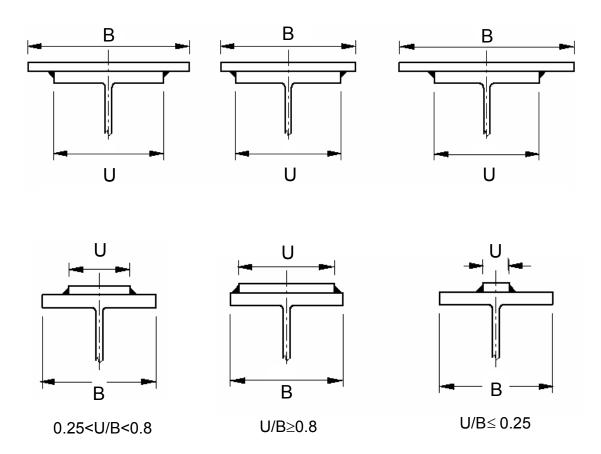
Rolled I- or H-sections with welded flange plates
